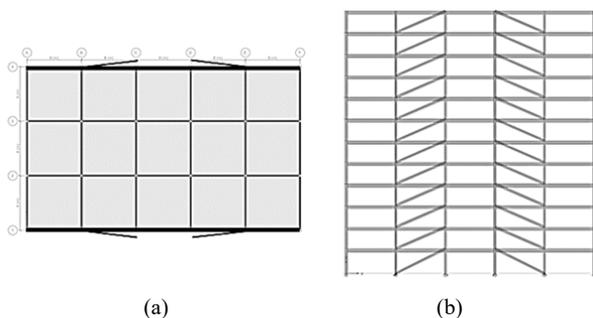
Building geometric configuration (a) Floor plan (b) Exterior frame
